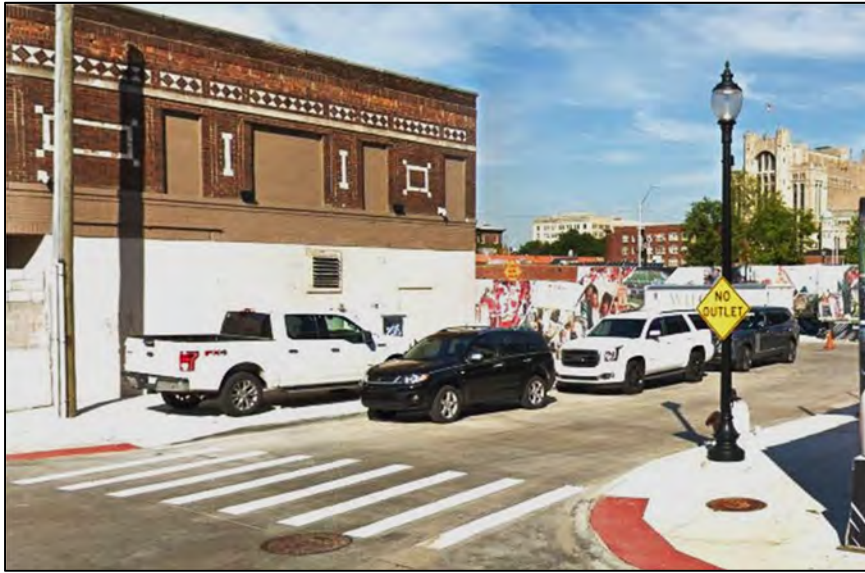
View northwest from intersection of Clifford and Henry Streets toward project site (Google image captured 9/2018).
